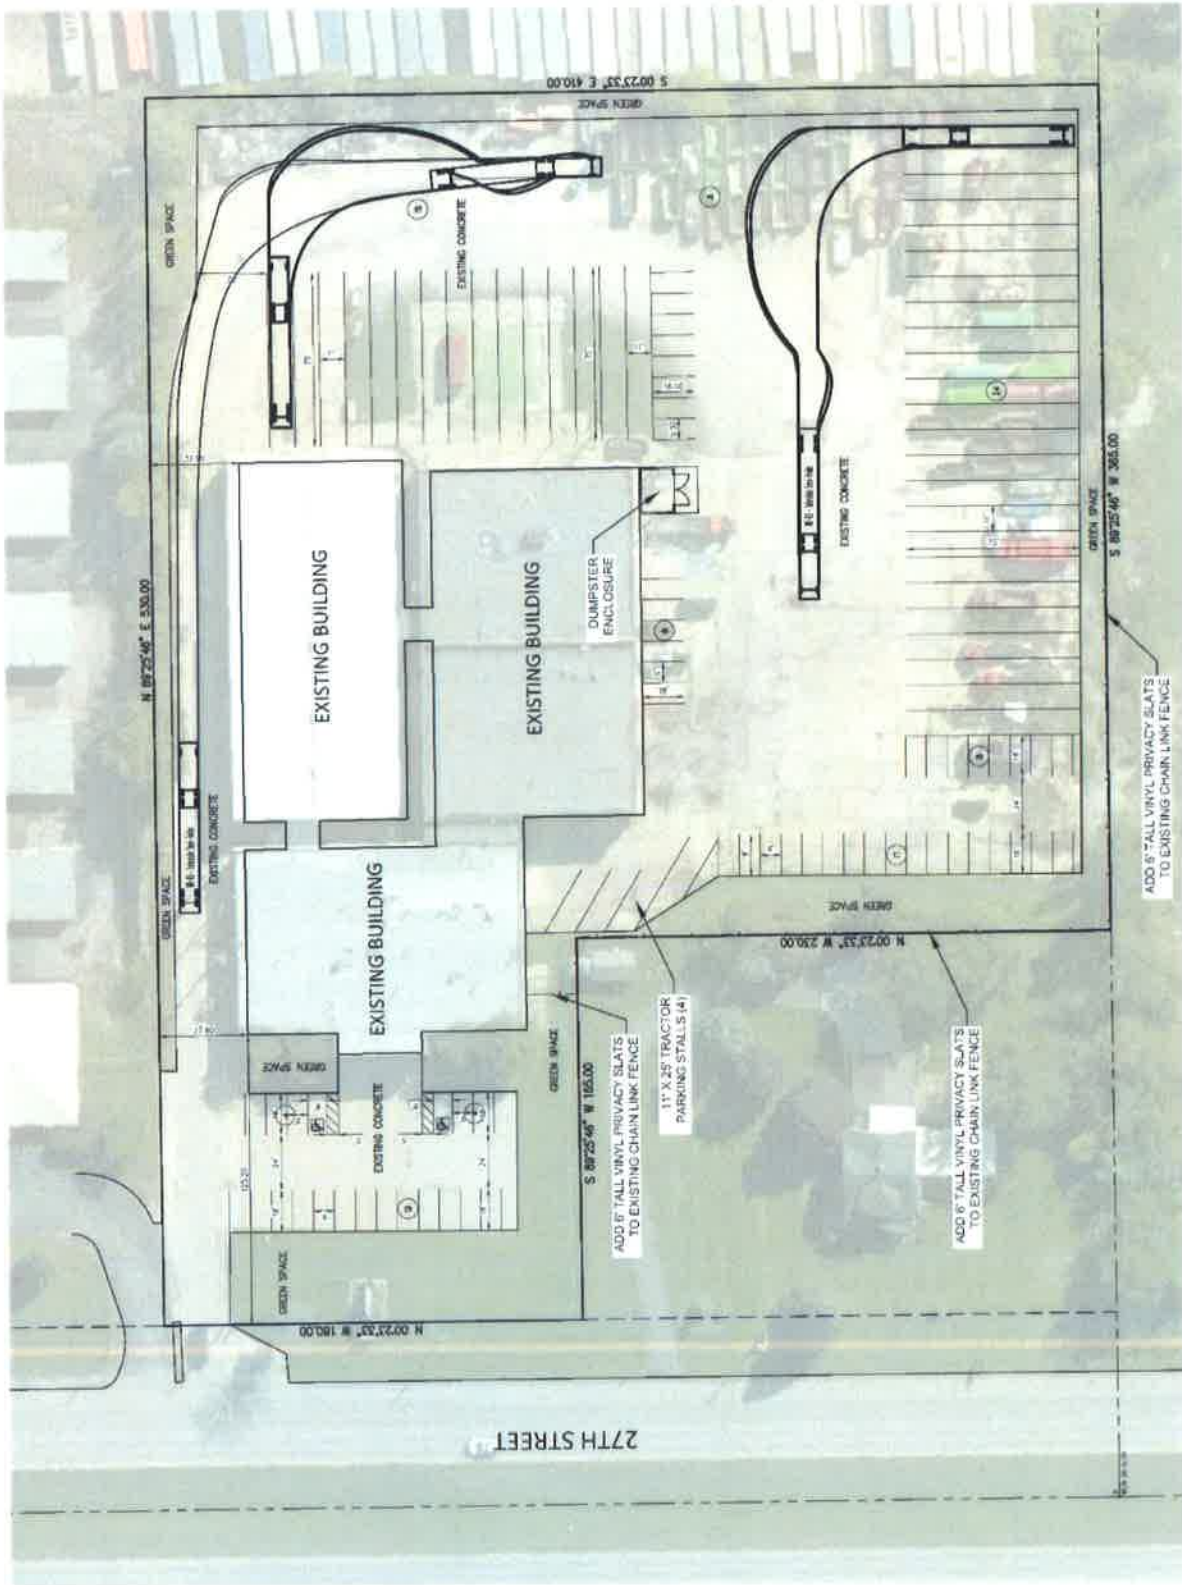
EXHIBIT A CONT'D: CONCEPTUAL SITE PLAN (ENLARGED)
